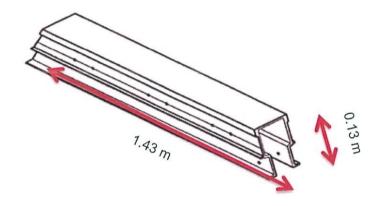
Deck Mid – Beam Source: architectjaved.com (n.d)
